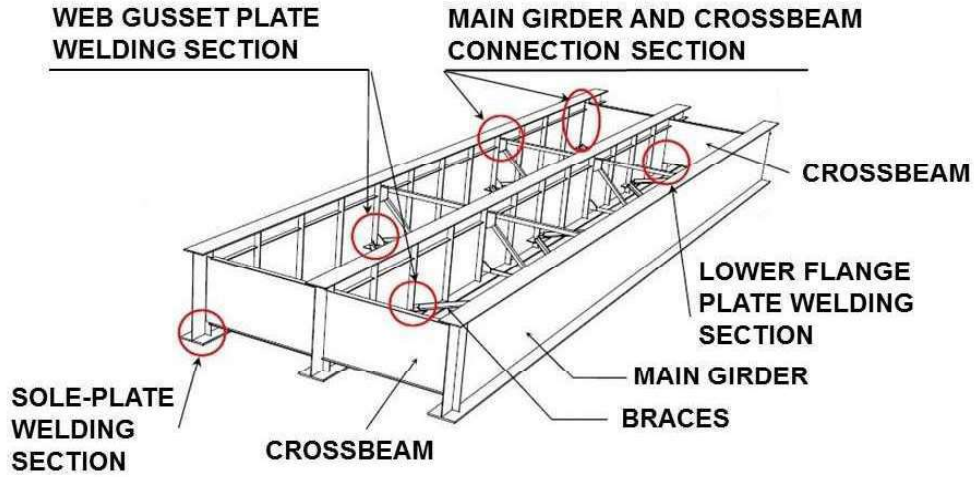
Common damage location in a girder-type bridge.
